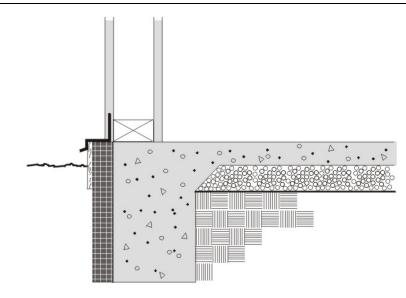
Unheated Slab-on-Grade Floor
